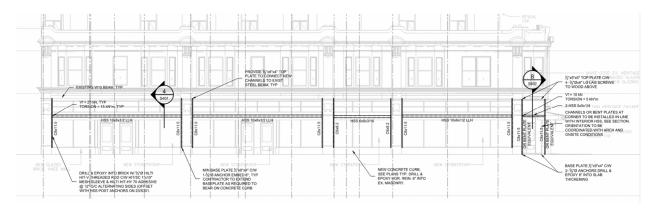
Ground Level Façade Back-Up Framing along Pandora
